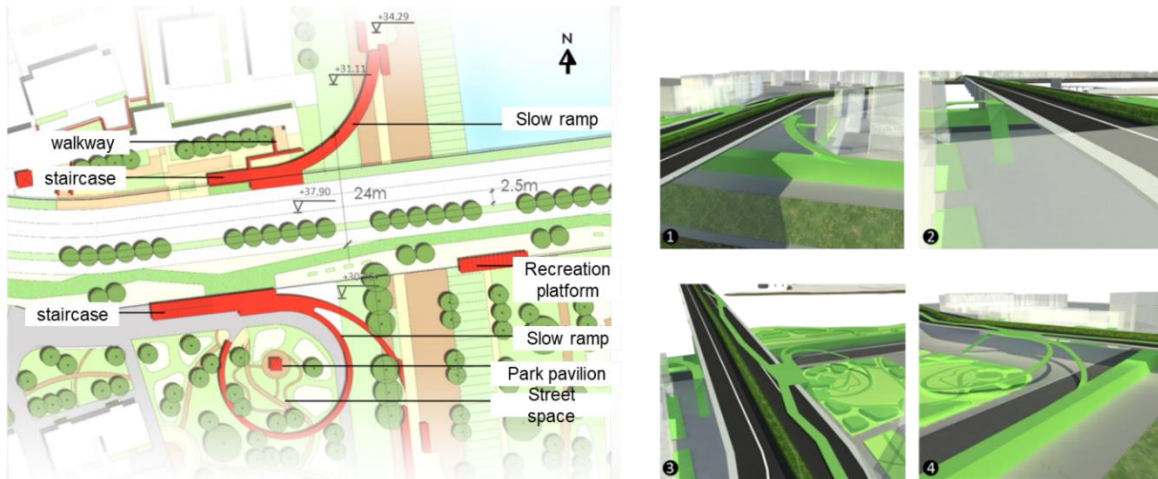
Reconstruction of the west end of Lanjiang Bridge
